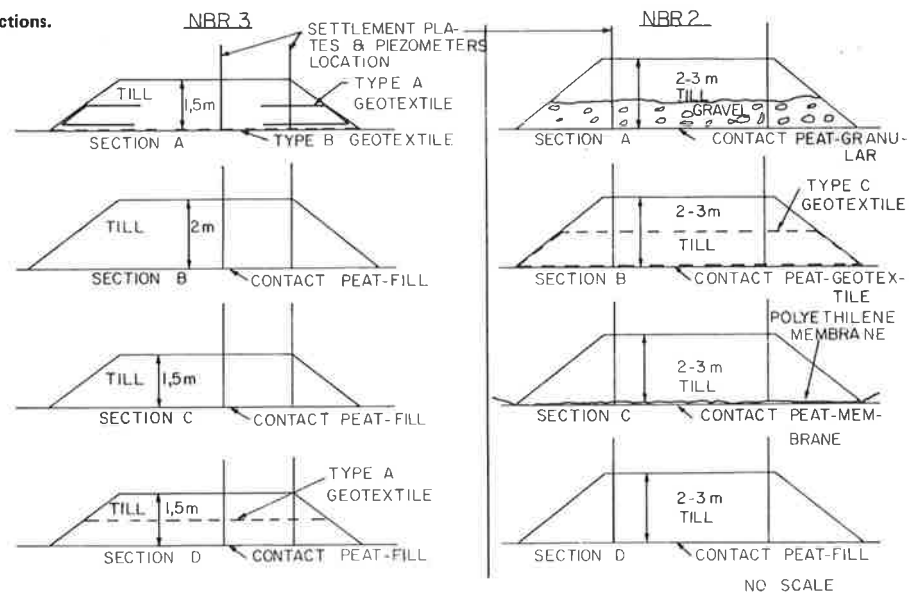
NBR-2, section B: first layer of fill wrapped with type C geotextile.
